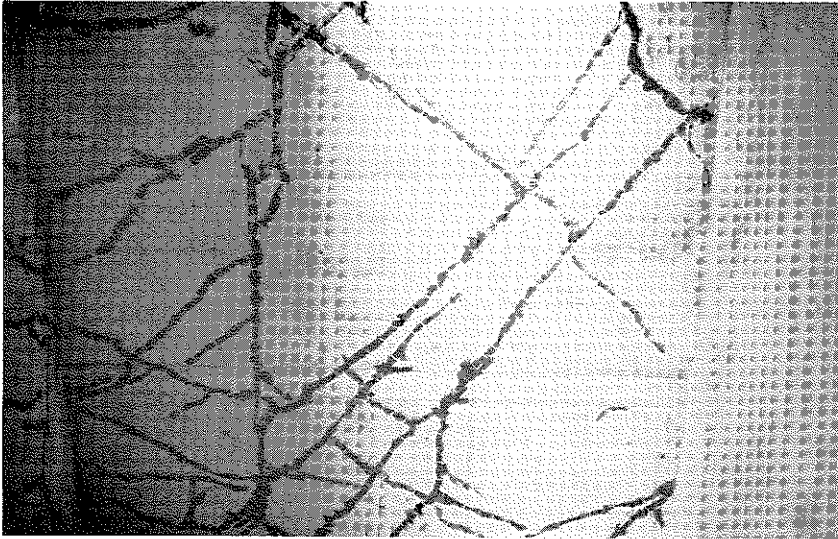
Interior view of shear wall with cracks made visible by the epoxy. Indian Hills Medical Center.
